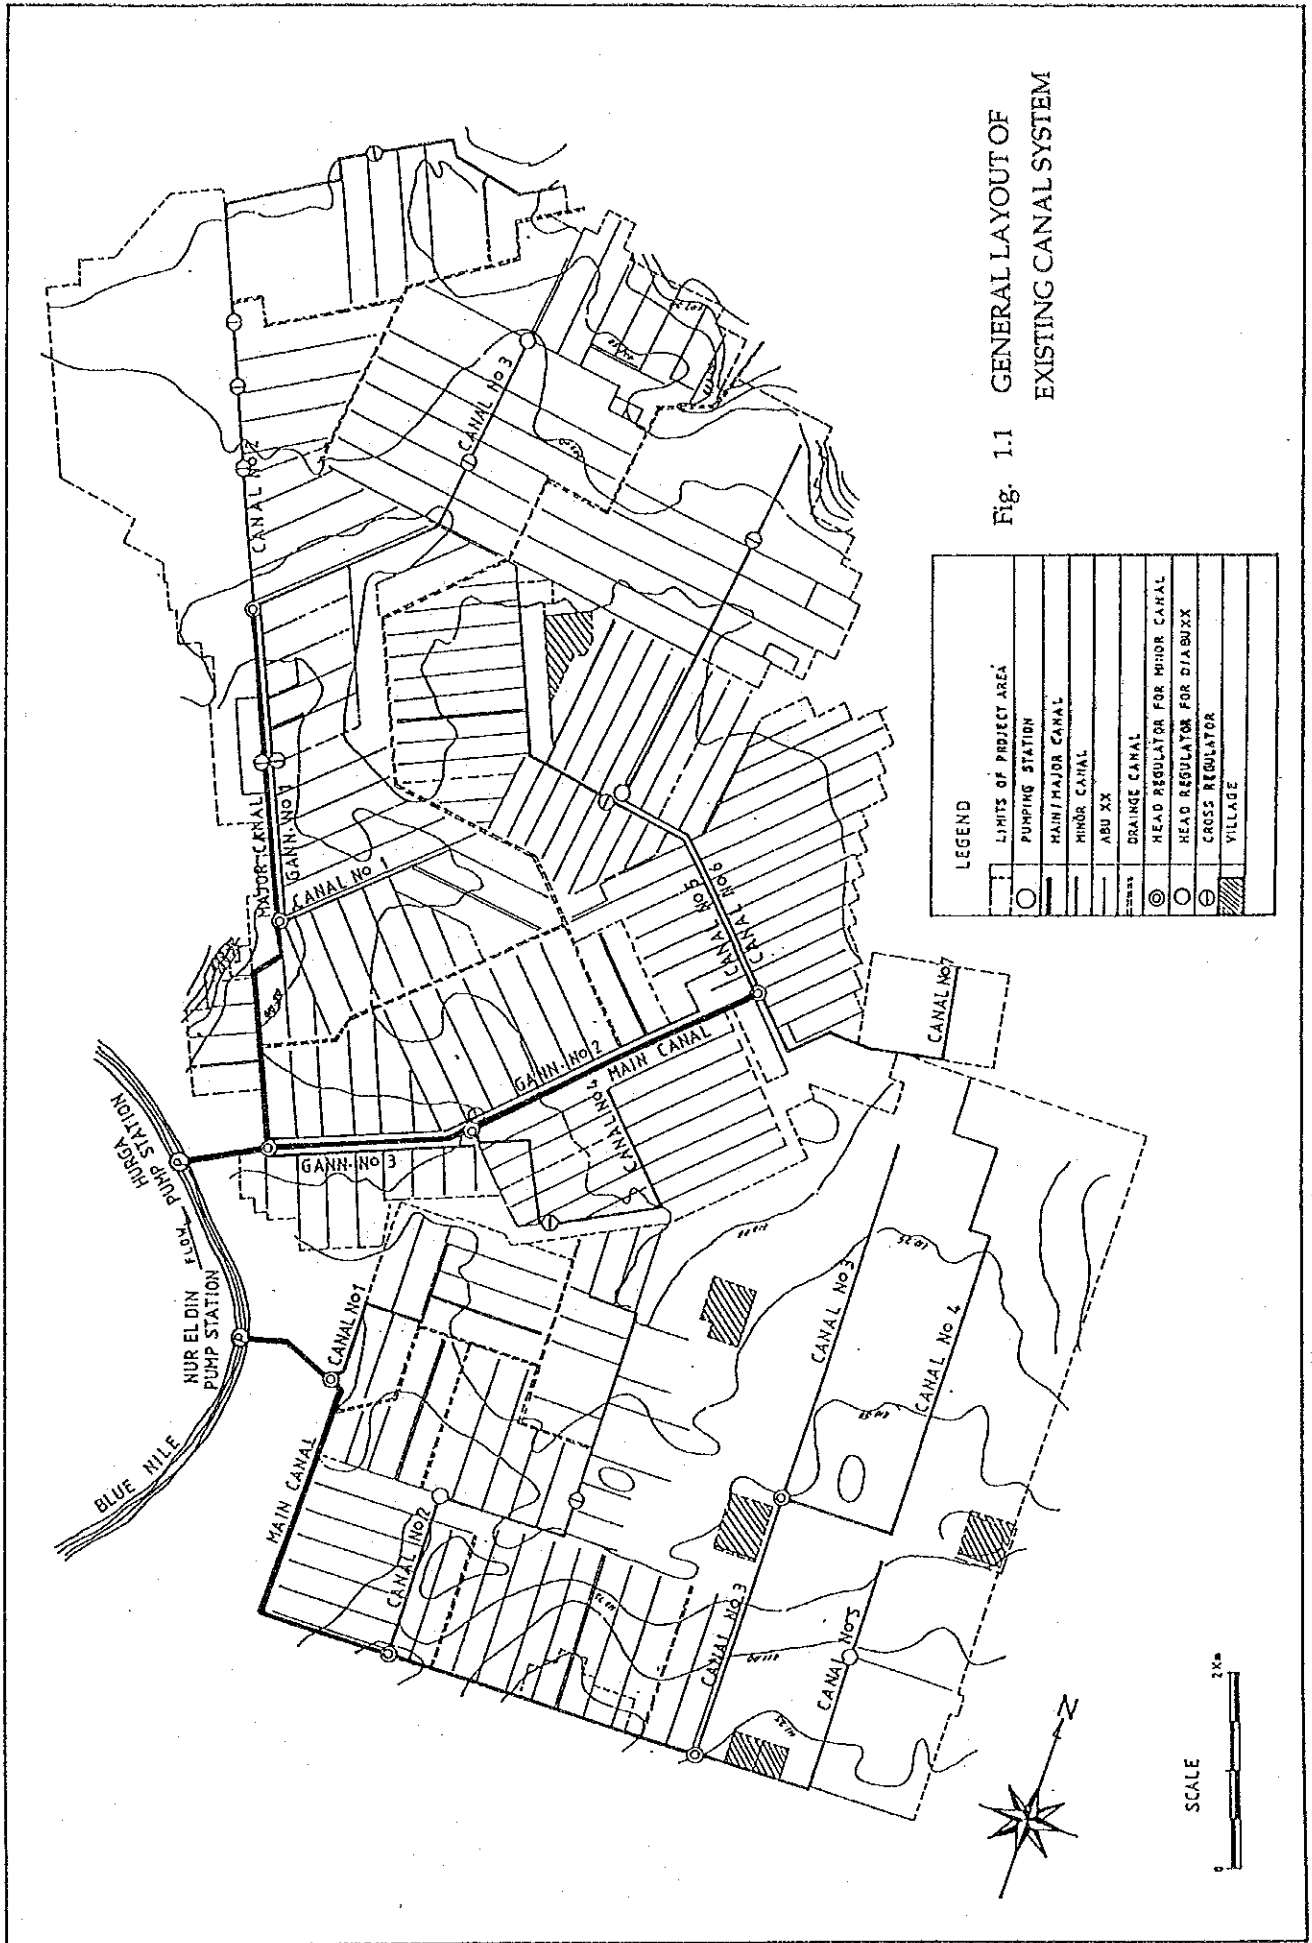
GENERAL LAYOUT OF EXISTING CANAL SYSTEM
